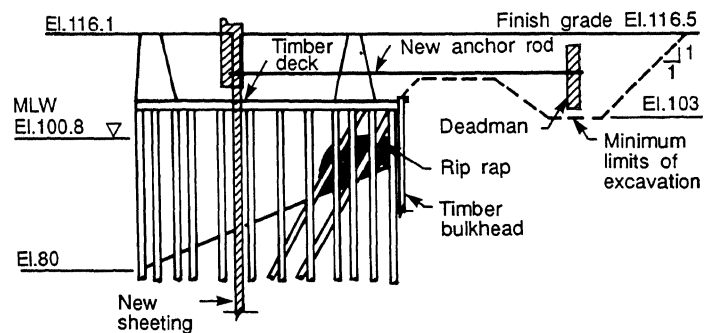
Anchored Bulkhead at Previously Existing Relieving Platform
